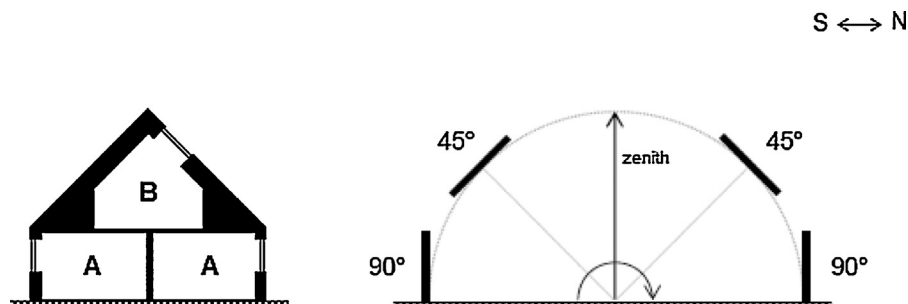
Vertical section of a 1½-storey single-family house indicating the spaces A–B with typical use of roof and façade windows and the related combinations of window slope and orientation.
